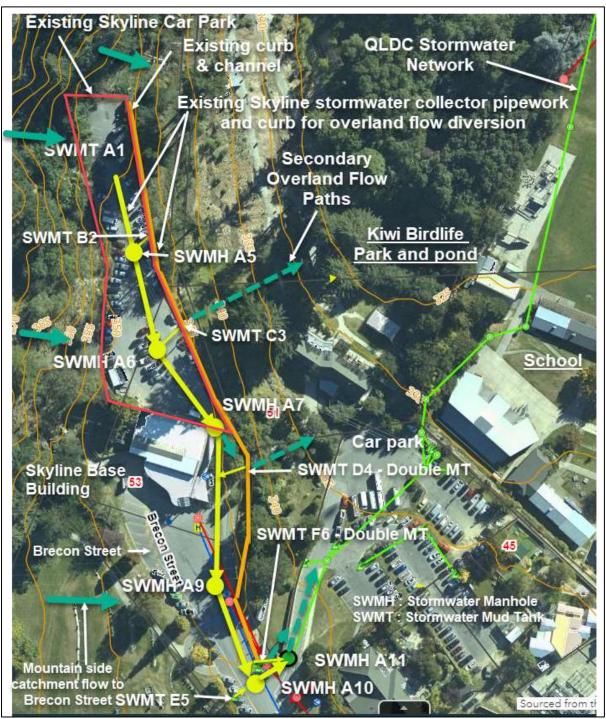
E isting Skyline / Brecon Street Stormwater Infrastructure Plan
